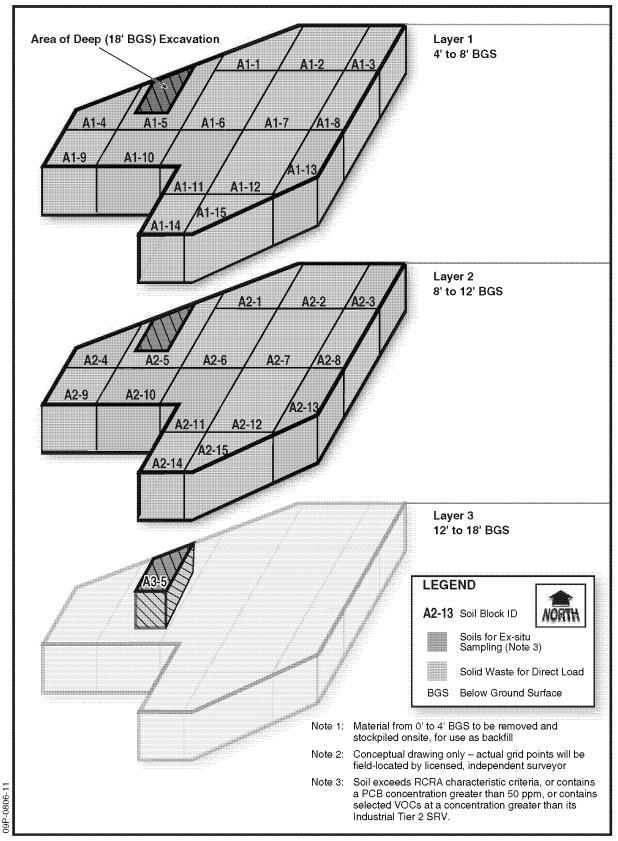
SOIL DISPOSAL PROFILE AREA A, WOODBURY SITE WOODBURY, MN
